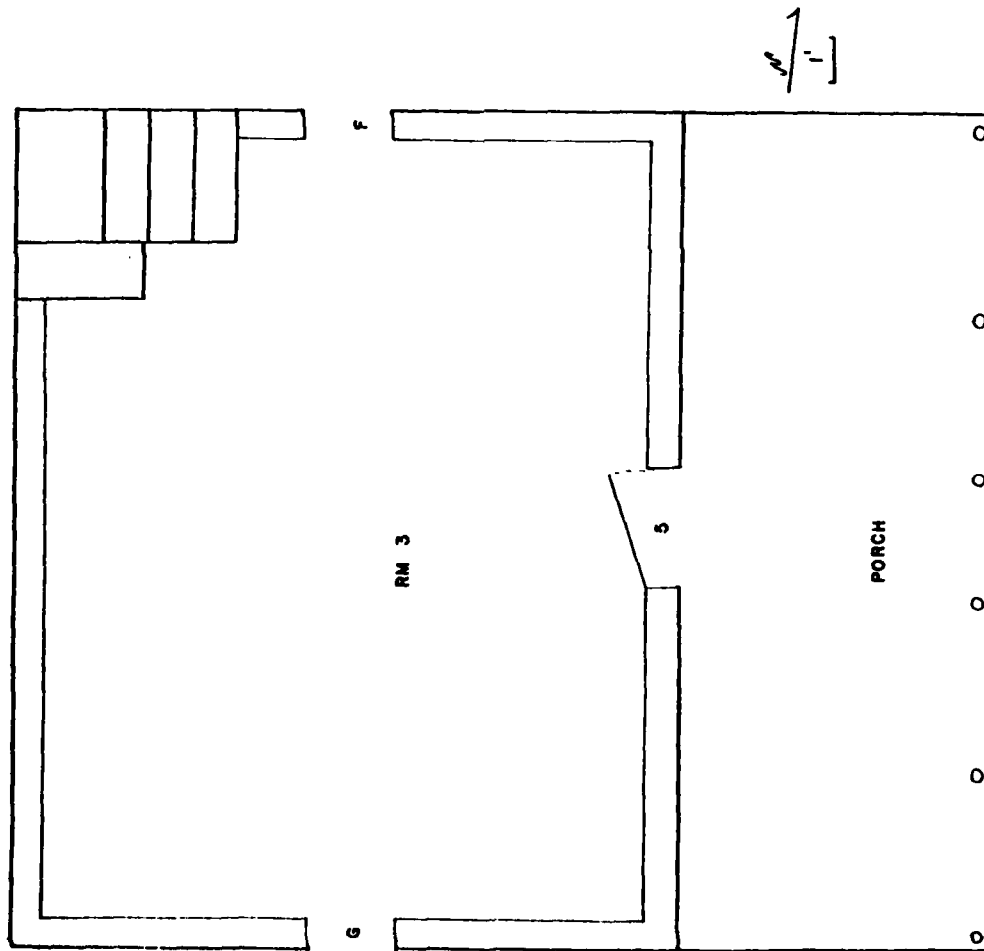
Floor plan of upper storey (Room 3) of dwelling on Tract 102.
